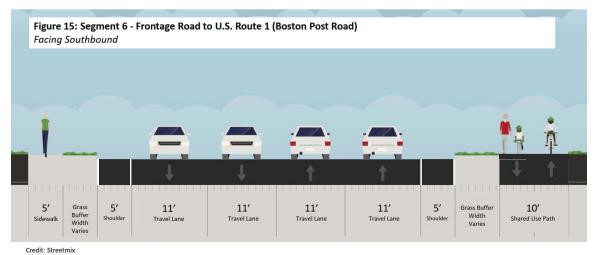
and 16 show the improvements developed for the Route 161 corridor segment between Frontage Road and U.S. Route 1 (Boston Post Road). The improvements include:
